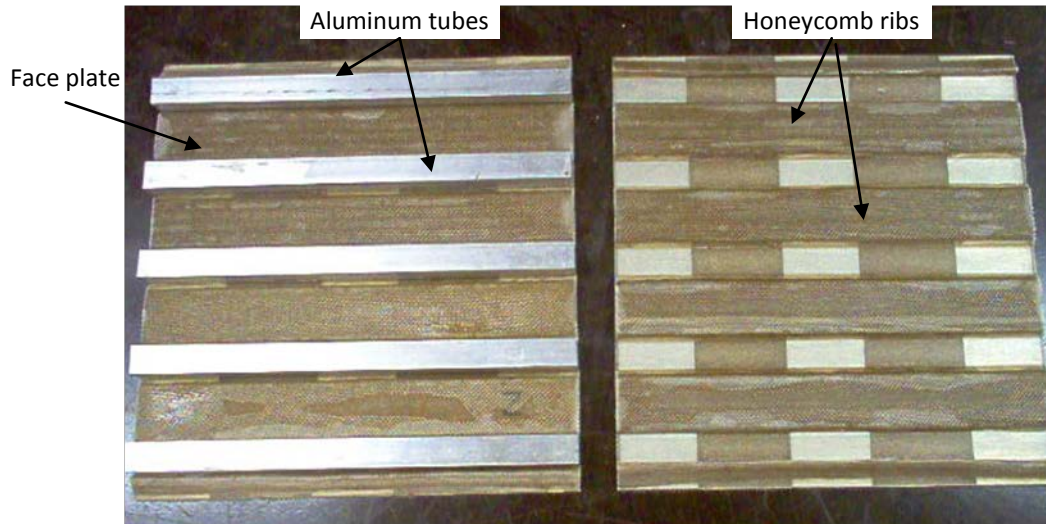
FIBERPLATE Design with Aluminum Tube Cross Members, Fiberglass Top and Bottom Face plates, and Paper Honeycomb Rib Stiffeners.
